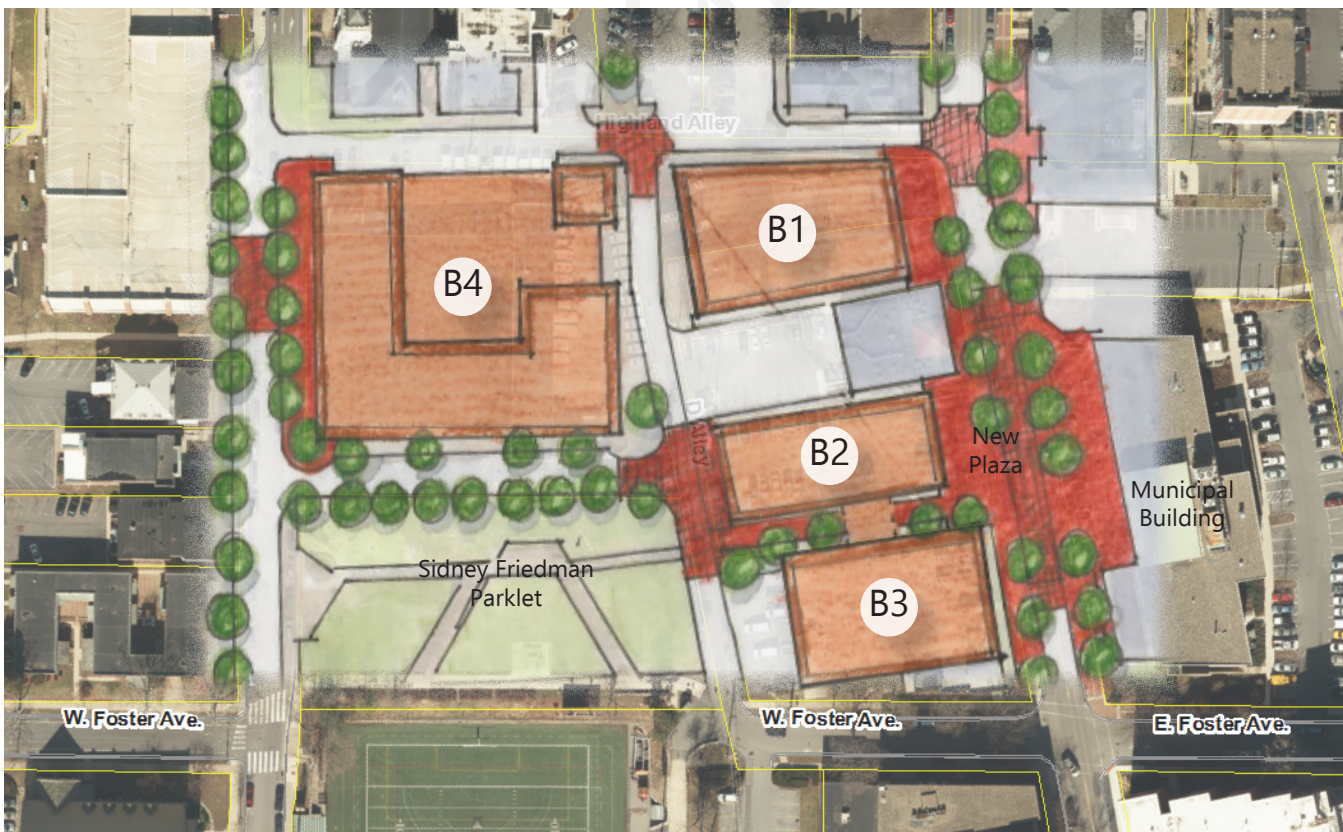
Conceptual Site Plan- Option B: This site plan illustrates two small redevelopments on the Allen Street Parking lot (B2) and on the former Verizon Building and FNB sites (B1). It also illustrates redevelopment above the existing post office site (B4) and Verizon Switching Station (B3), and a plaza-like paving treatment across Allen Street in front of the Municipal Building to expand a central gathering place.
